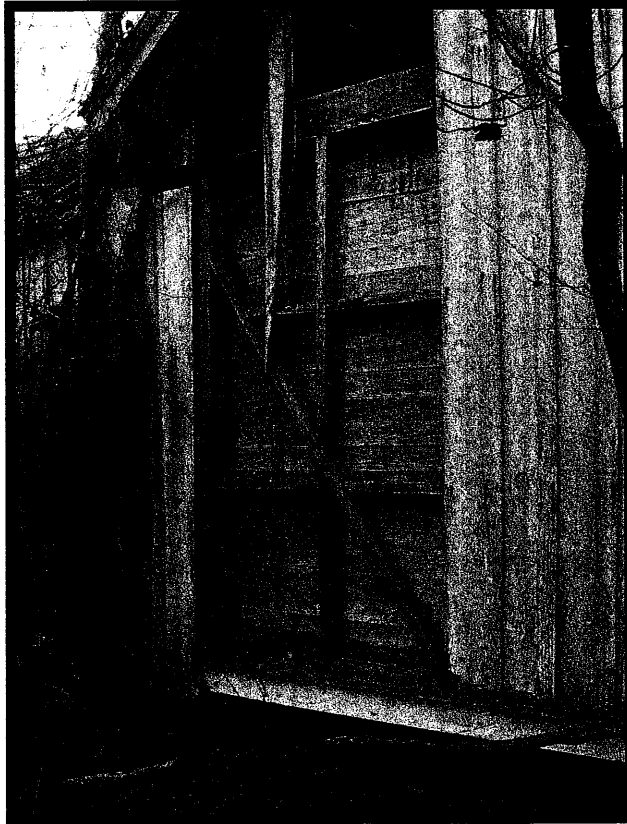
View of Dunn Tenant House, Detail of Northwest Gable End Looking East.
